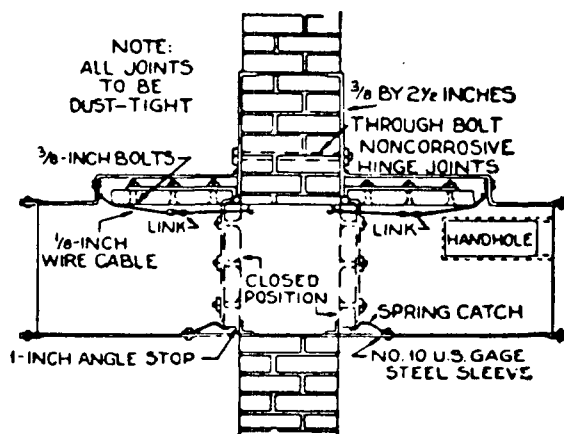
Suggested type of automatic hinged fire door for duct passing through opening in fire wall.
